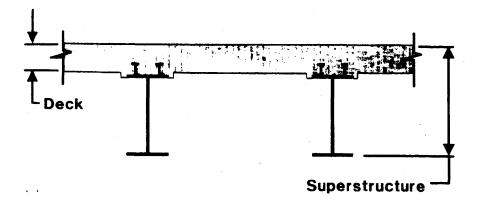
Composite Bridge with Concrete Deck on Steel Beams
